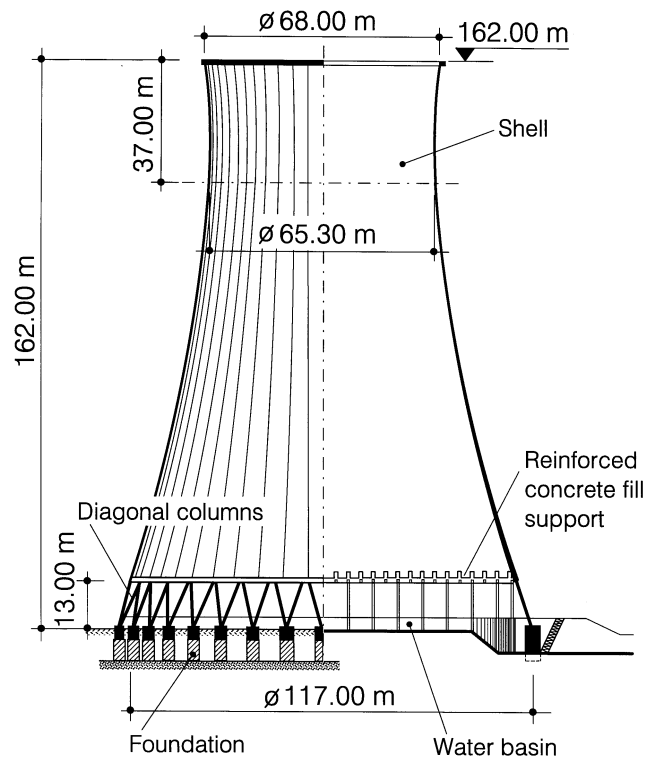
Cooling tower: Gundremmingen, Germany.
